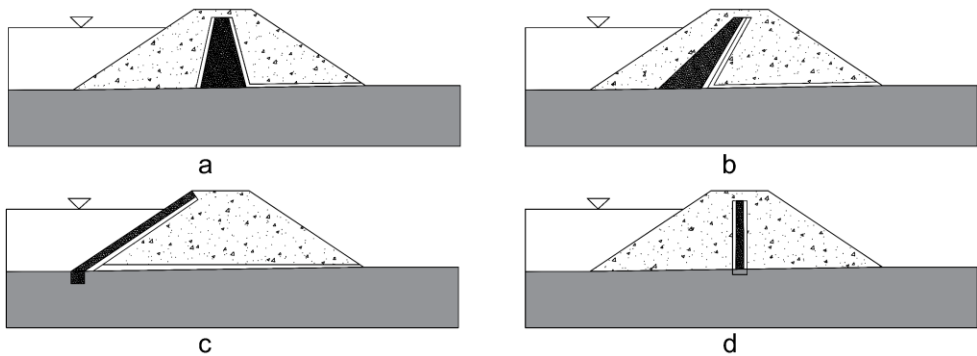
Main types of rockfill embankment dams: (a) Rockfill dam with central clay core, (b) Rockfill dam with inclined clay core, (c) Rockfill dam with concrete or asphaltic face, (d) Rockfill dam with central asphaltic membrane (adopted from Novak et al. (2014)).
